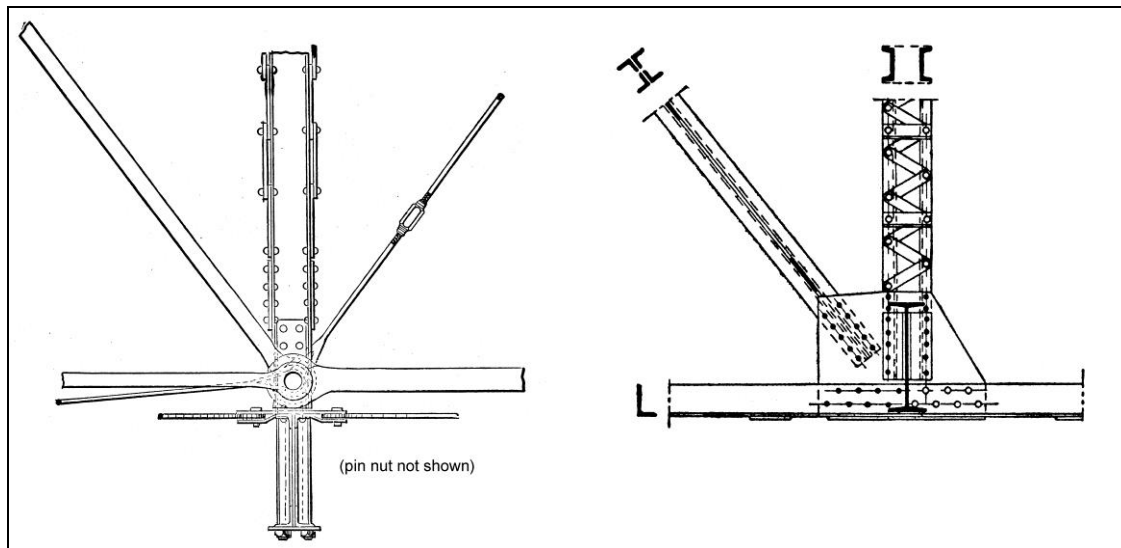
Example of Pratt truss lower chord and floor beam connections. Pinned example on left is of the type used on the three surviving 19th century NH bridges with the floorbeam suspended from the pin with U-bolts below the lower chord. The riveted example on right is typical of surviving 20th century NH bridges. It shows the floor beam framed into the lattice column above the lower chord and all members joined with rivets and angles to a gusset plate. (Colliery Engineering Company, 1897; Ketchum, 1920).
